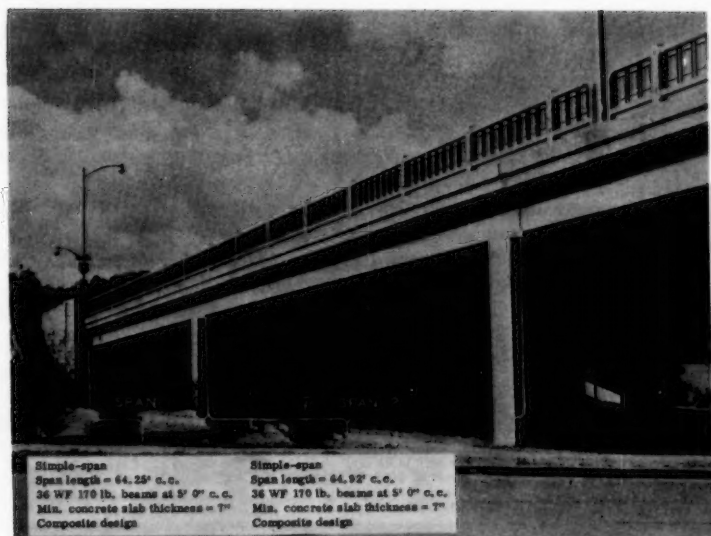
Bridge B1 & B2 of 33-6-4. Main Street in Lansing.
